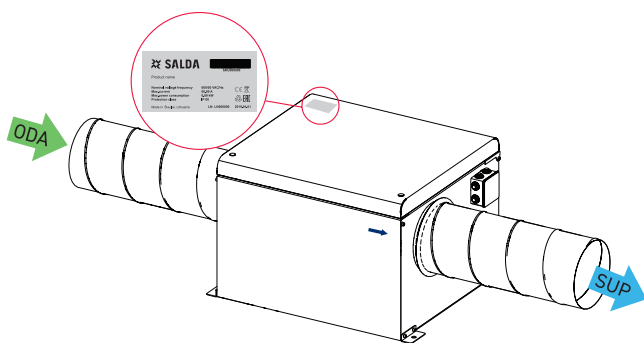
AKU / AKU EKO technical label place and air flow direction
